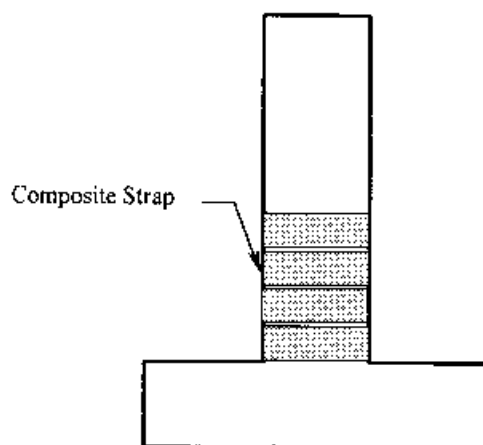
Typical concrete column wrapped with composite strap in the potential plastic hinge region.
